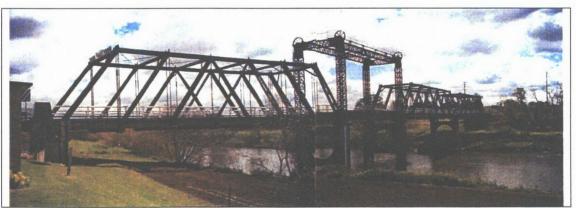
Bridge Panorama looking north west from southern bank (note lift span).
